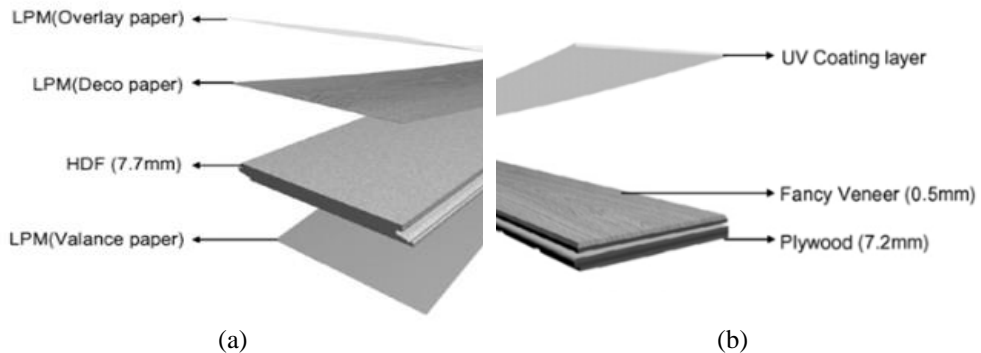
Layers of the laminate (a) and engineered (b) flooring [29]
